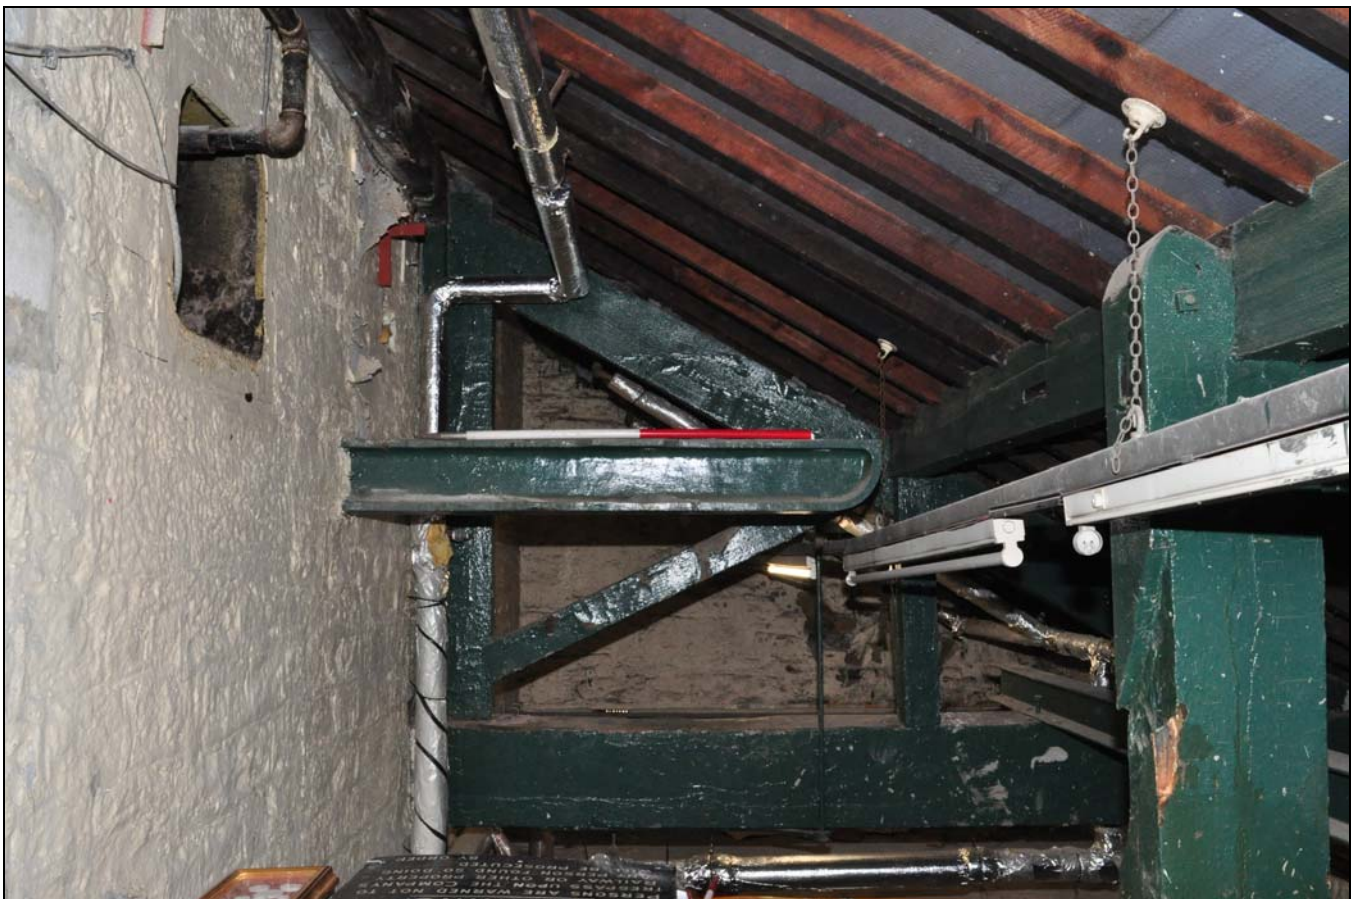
Cantilevered iron beam in roof space over engine house, from the north-west
